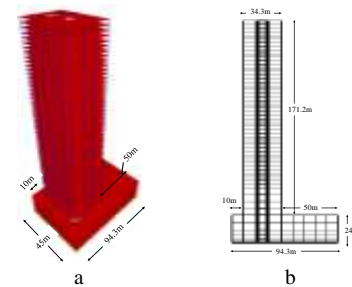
Selected (50+5B) reference RCC core wall building a) 3D sectional elevation b) Equivalent 2D sectional strip
